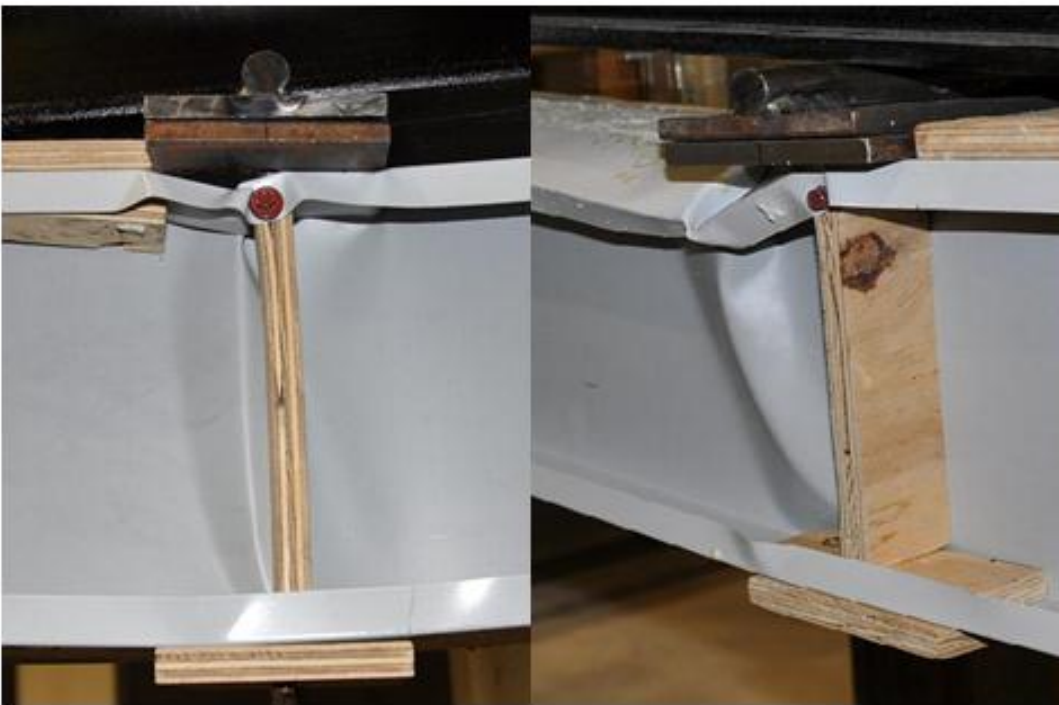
Local flange and web buckling failure (Series 2\_3)
